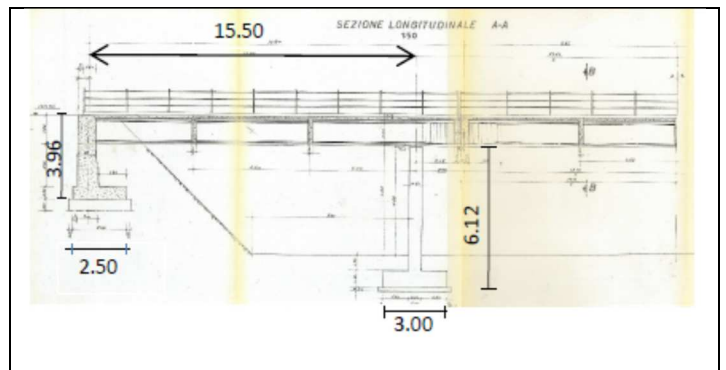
Original design drawings of the bridge: particular of the abutments / Disegni del progetto originale: spalla e piedritto.
